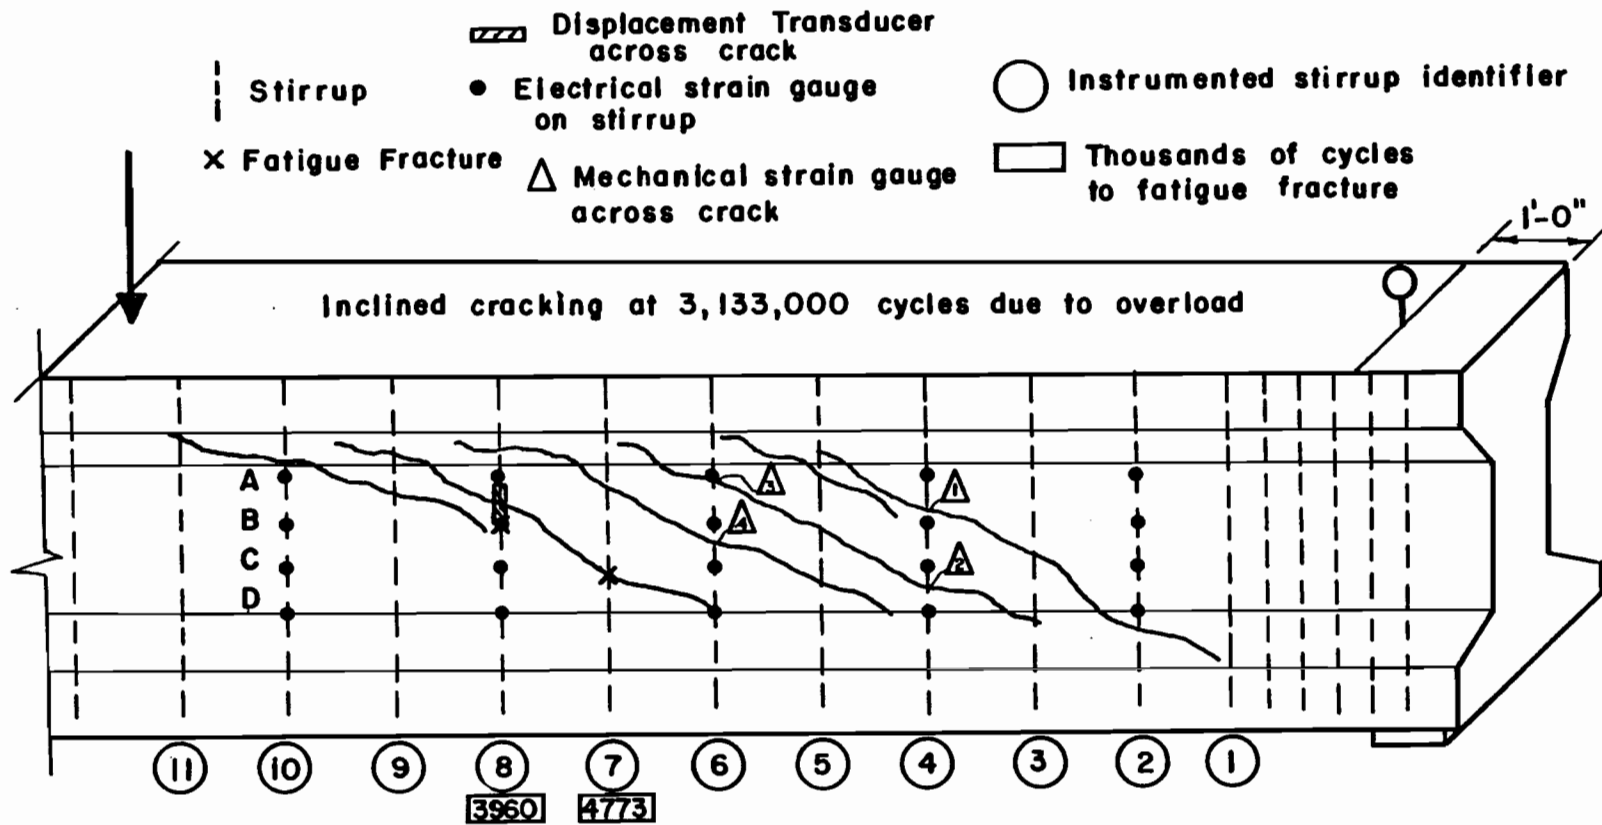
Beam 3, south shear span; instrumentation, crack pattern, and fatigue fractures
